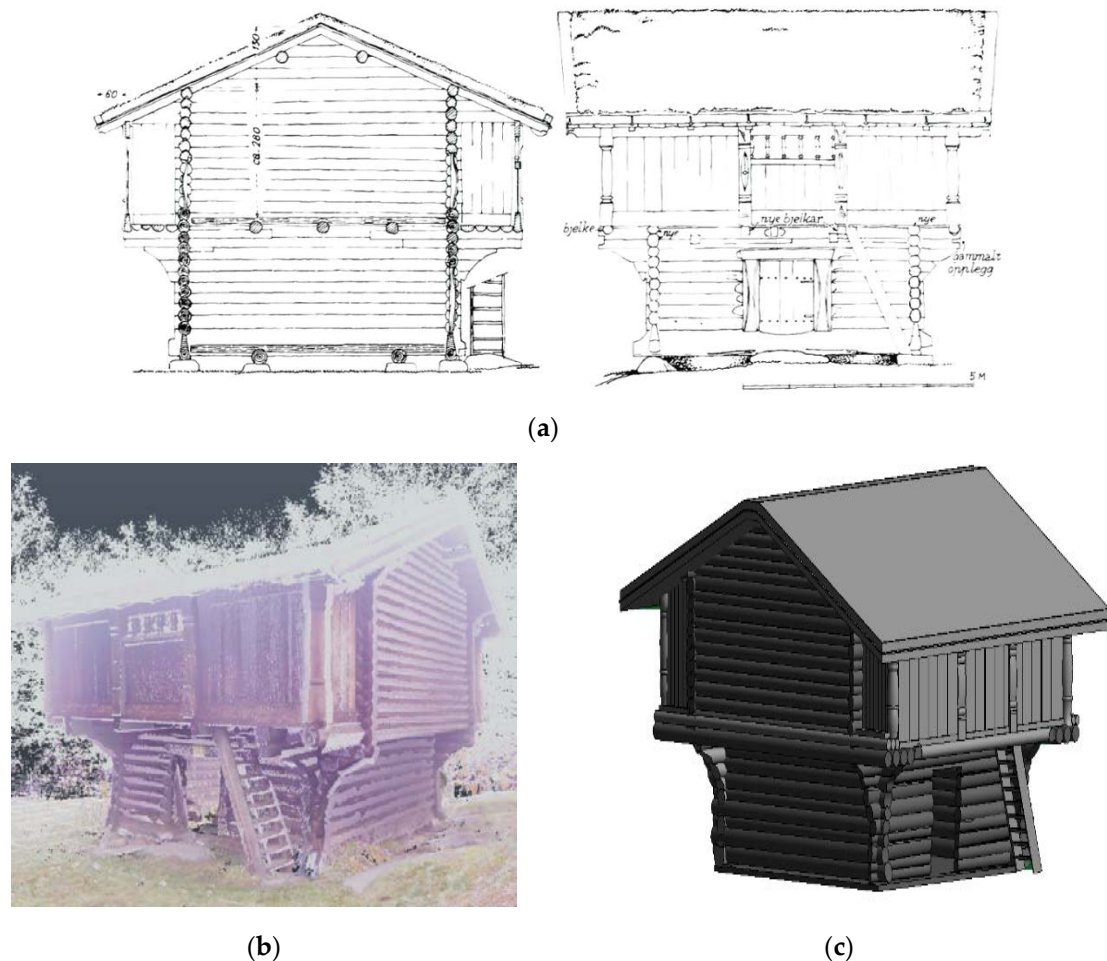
(a) Traditional two-dimensional (2D) view, reprinted from [28]; (b) Point clouds from three-dimensional (3D) laser scanner; (c) 3D drawing view of the Heierstad Loft, Tønsberg, Norway.
